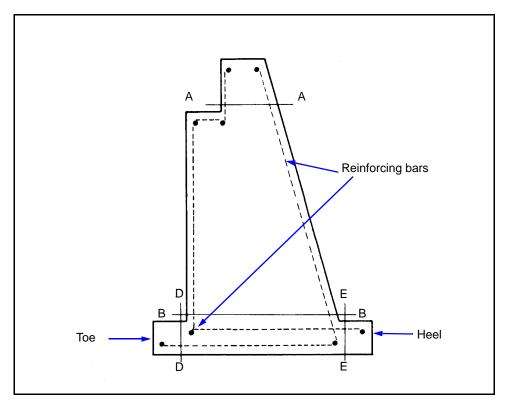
Reinforced Concrete Abutment With Critical Cross Sections
